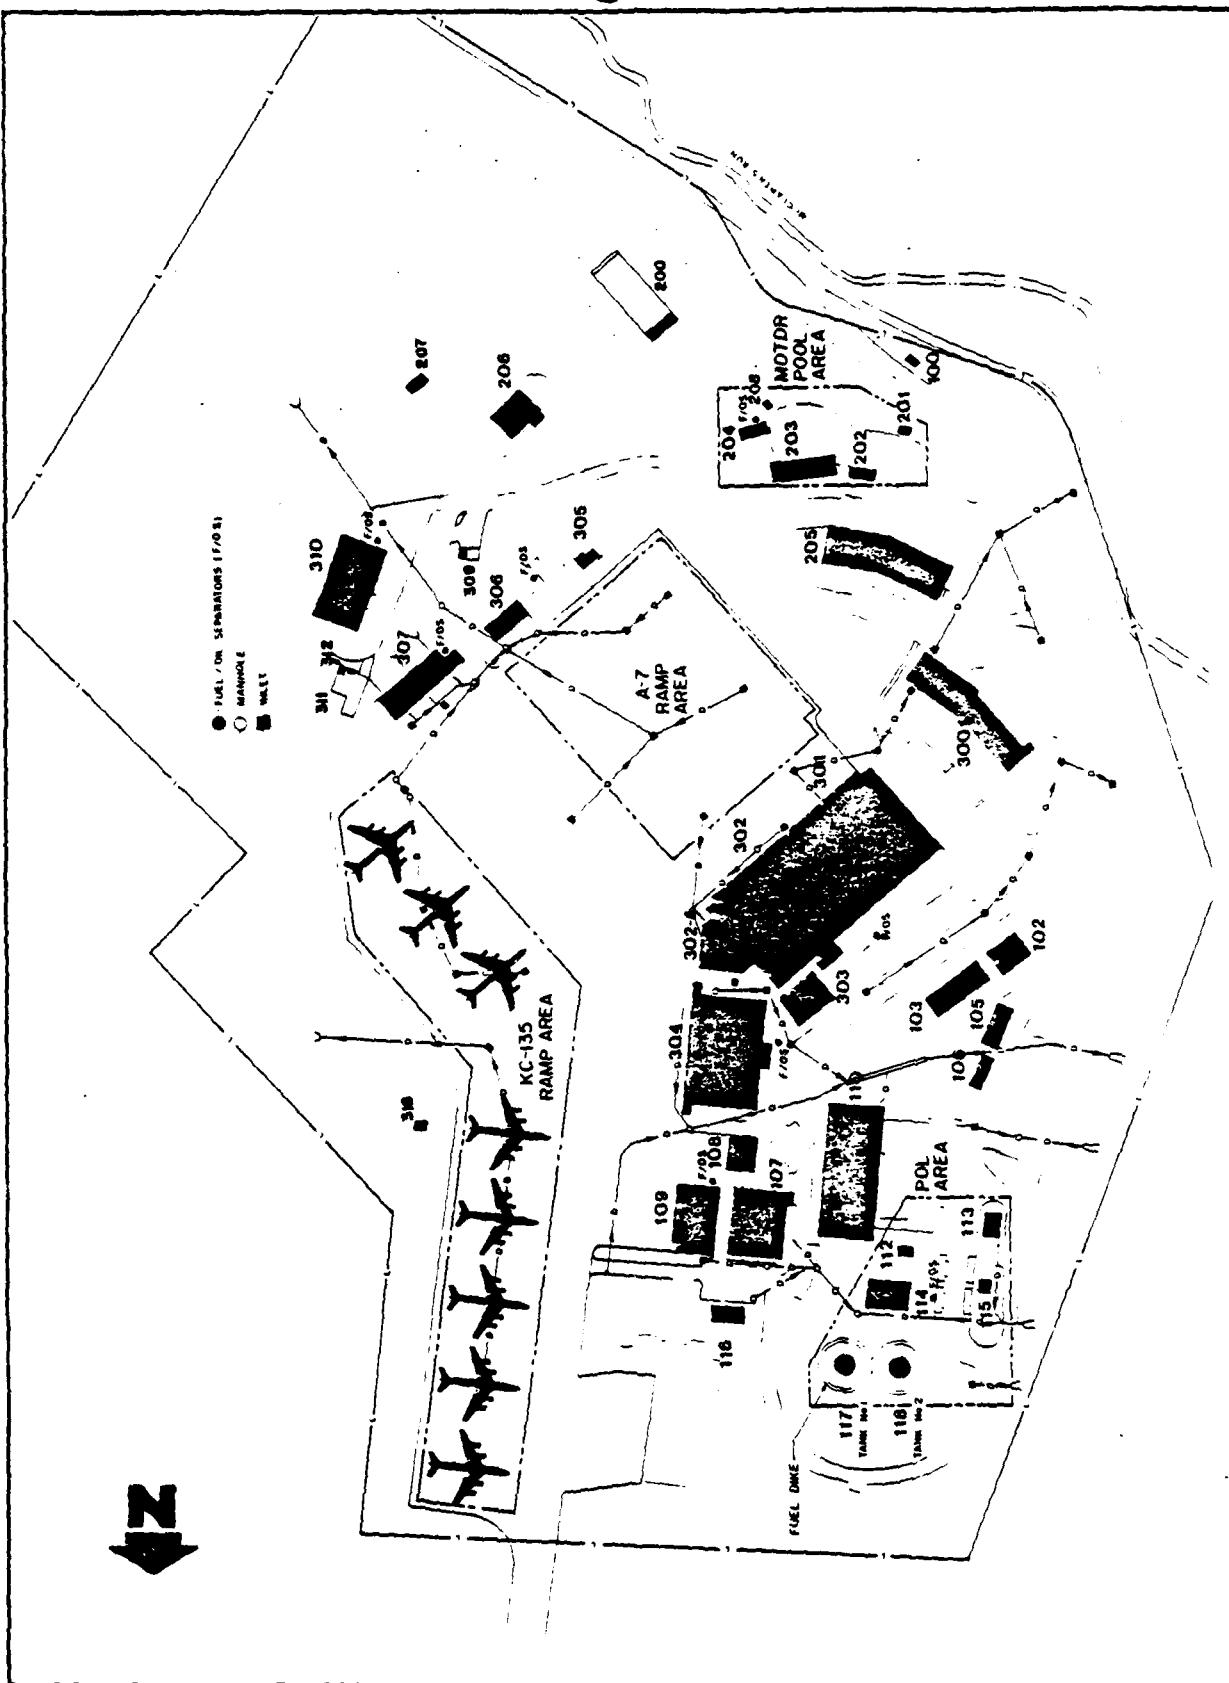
PENNSYLVANIA AIR NATION GUARD - FACILITY LAYOUT
